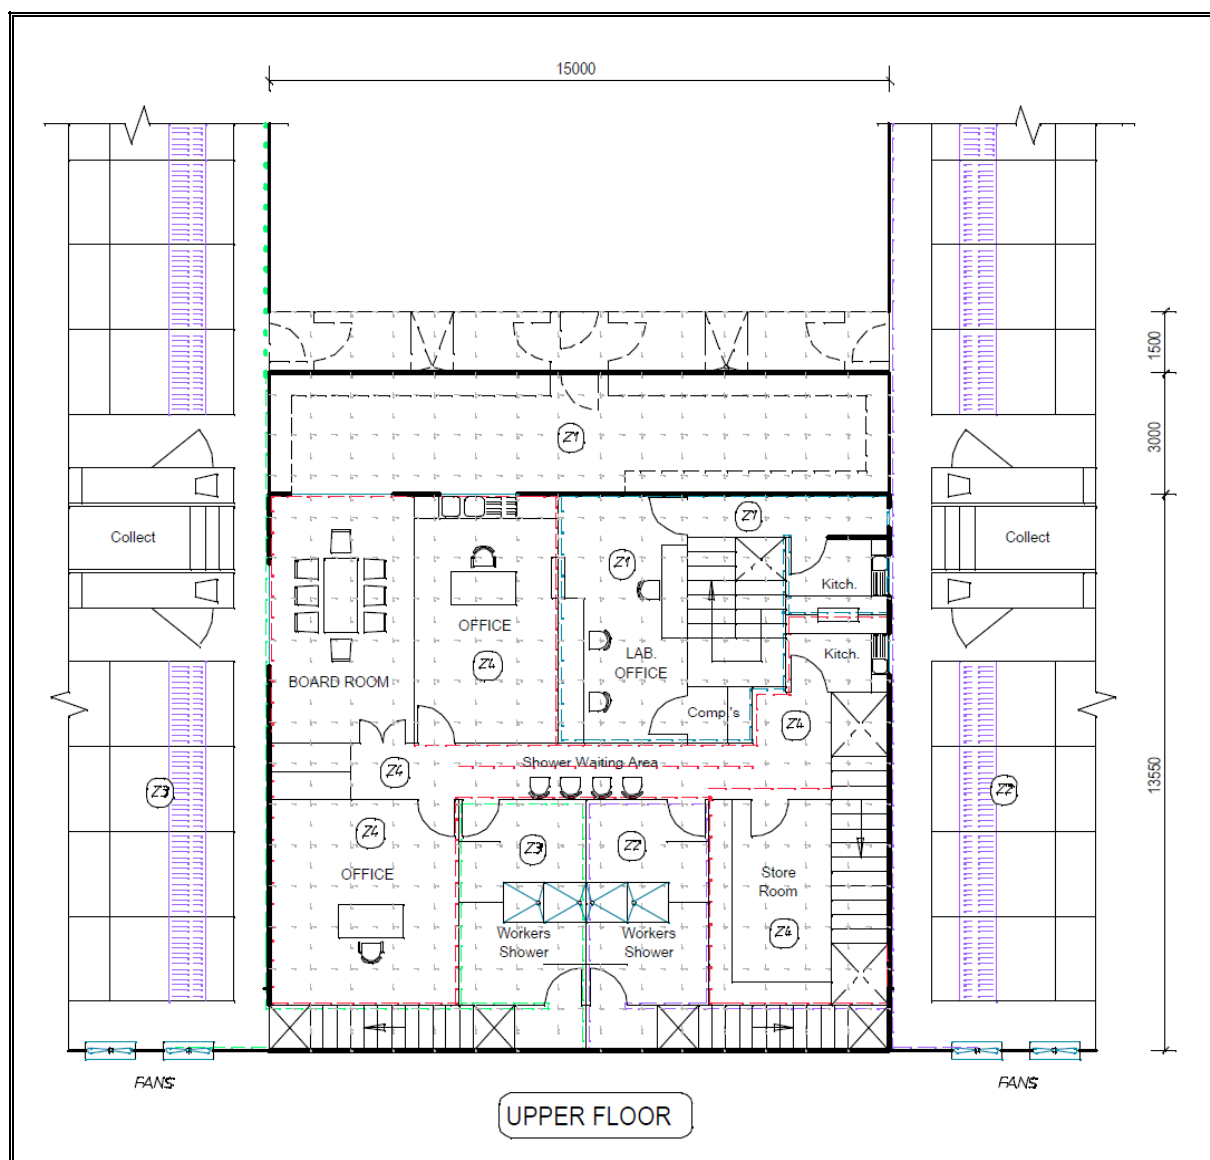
Proposed upper floor layout of the offices and laboratory (designed by Dalein Plaasbou, 2017)
